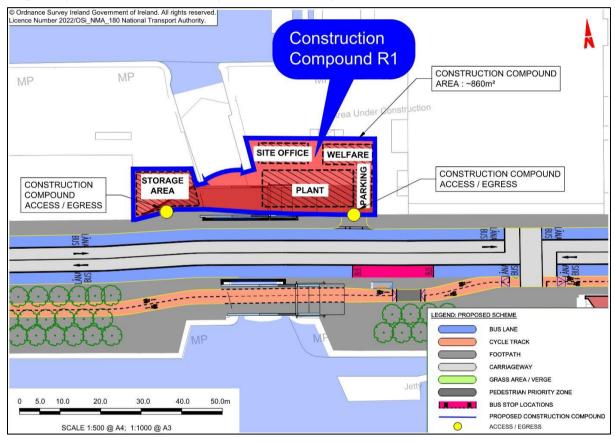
Proposed Location, Extent, and Layout Construction Compound R1 (Phase 1)
